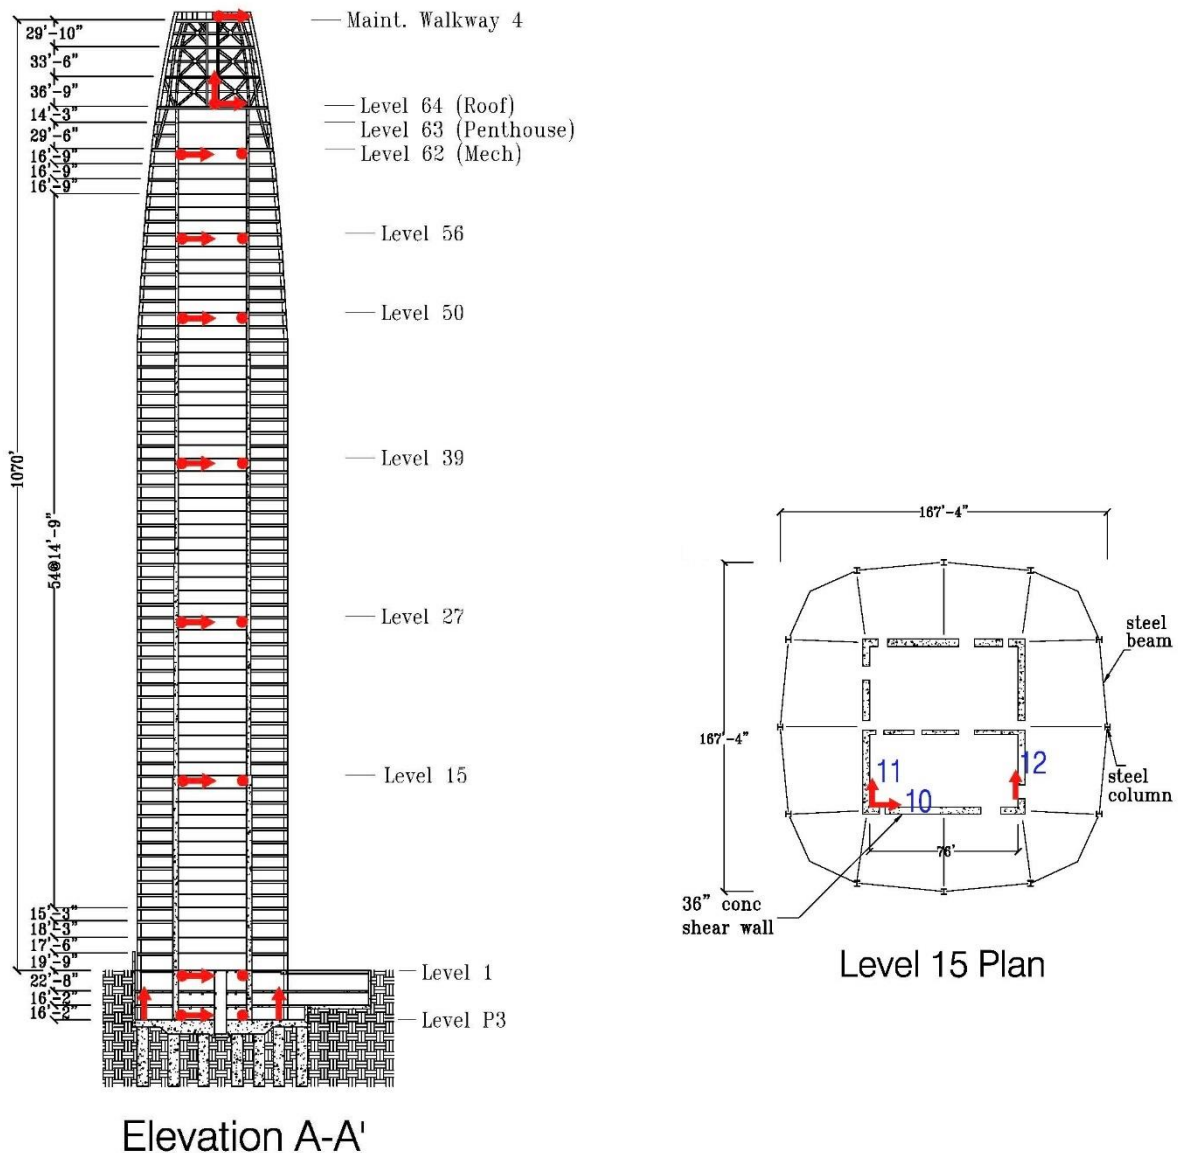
Elevation view showing the locations of the 32 sensors installed in the Salesforce Tower, and a typical framing plan for lower floors (Level 15 is shown).
